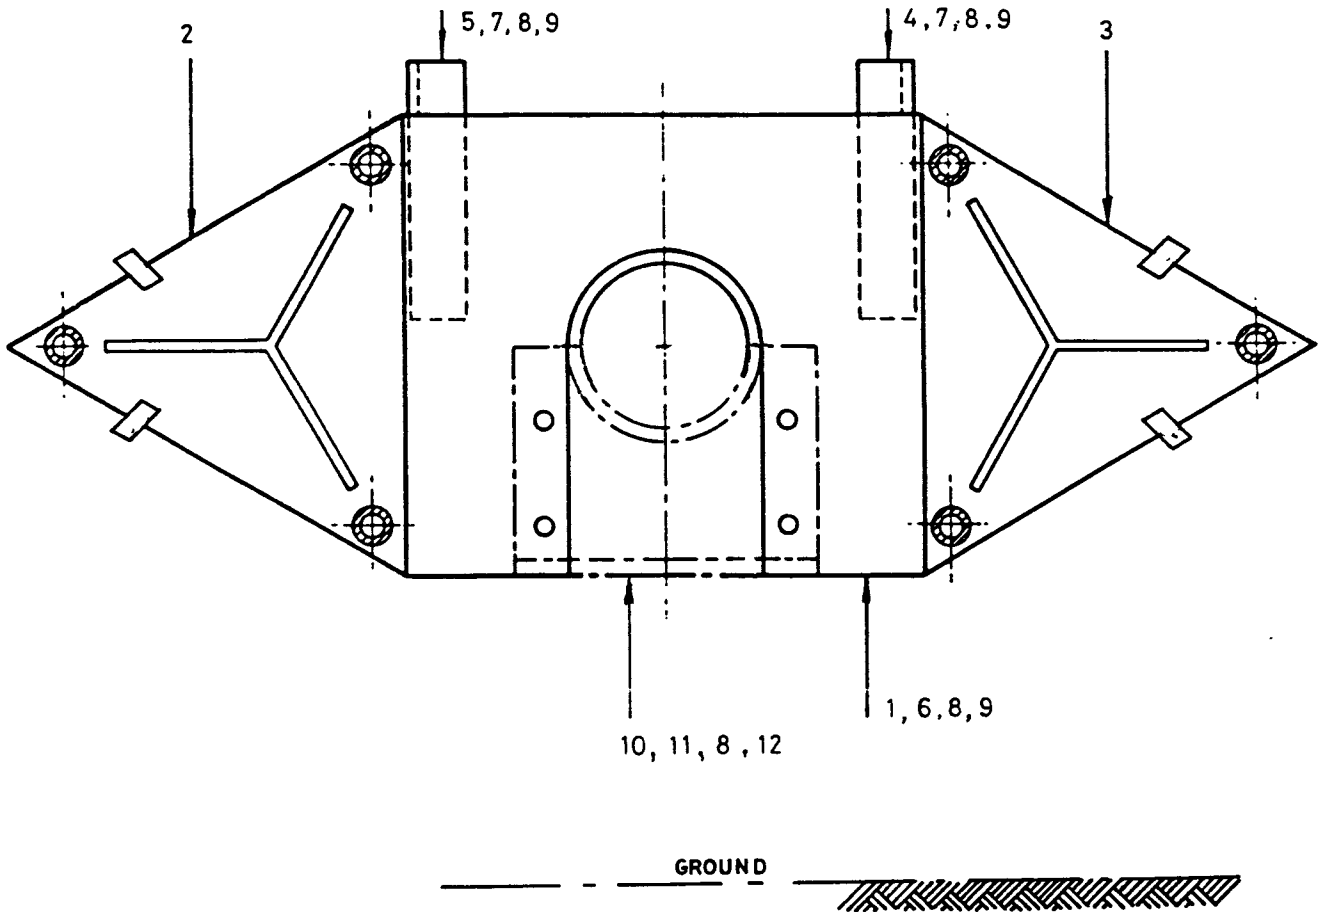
Intermediate guy attachment and bearing assembly viewed from top of twin lattice mast.
